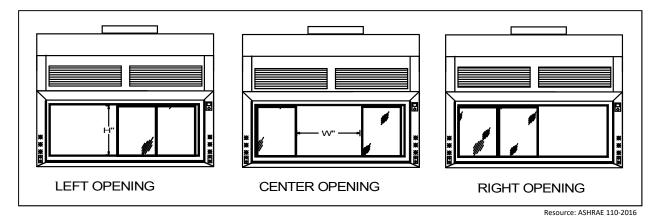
Sash Configuration for Benchtop LFH Equipped with a Horizontal Sliding Sash
